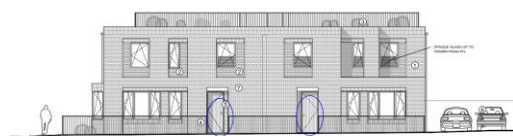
Internal East Flank Façade Mews Entrance Proposed this application
